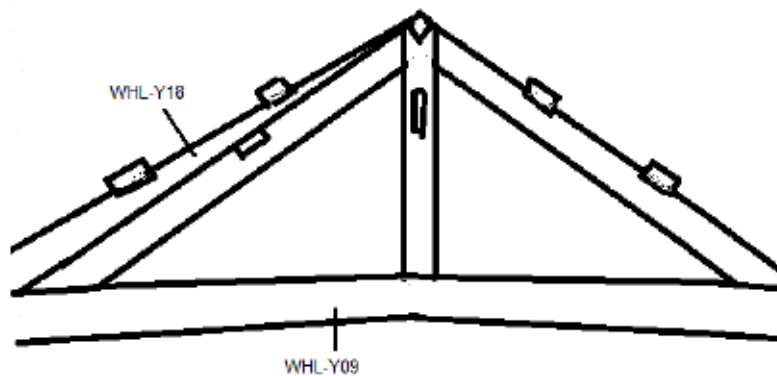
Sketch of truss 4, showing the location of samples WHL-Y09 and WHL-Y18
